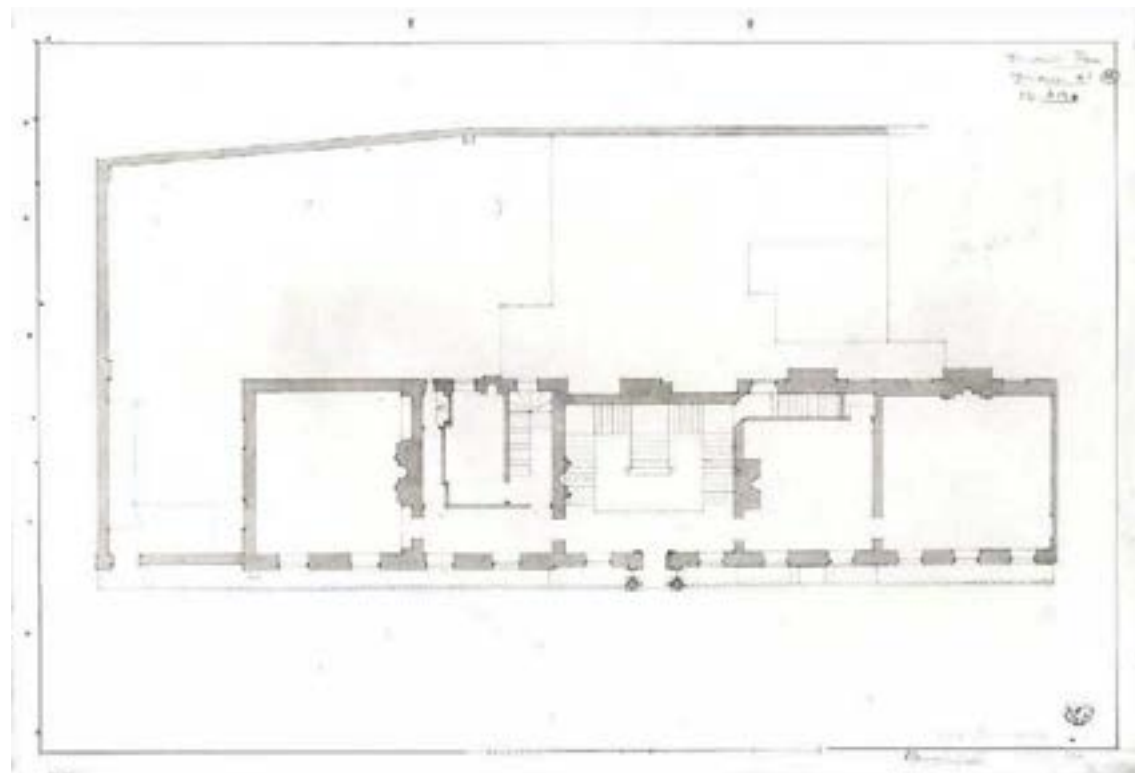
James Spiller’s 1799 plan of the ground floor of No 21. Soane Museum 57/7/44
